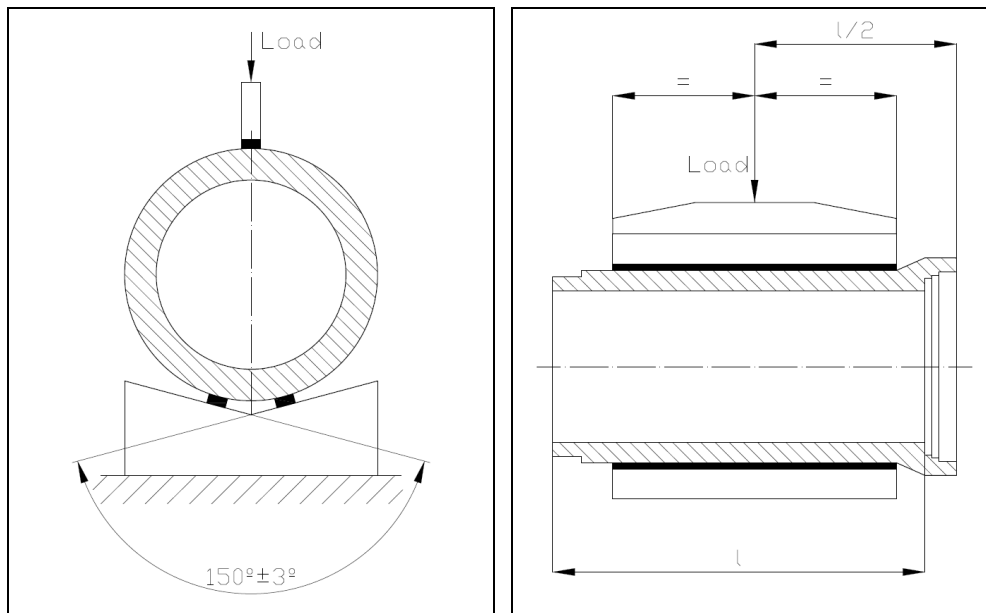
Samples placing in the universal testing machine: front view (left side) and side view (right side) [7].
